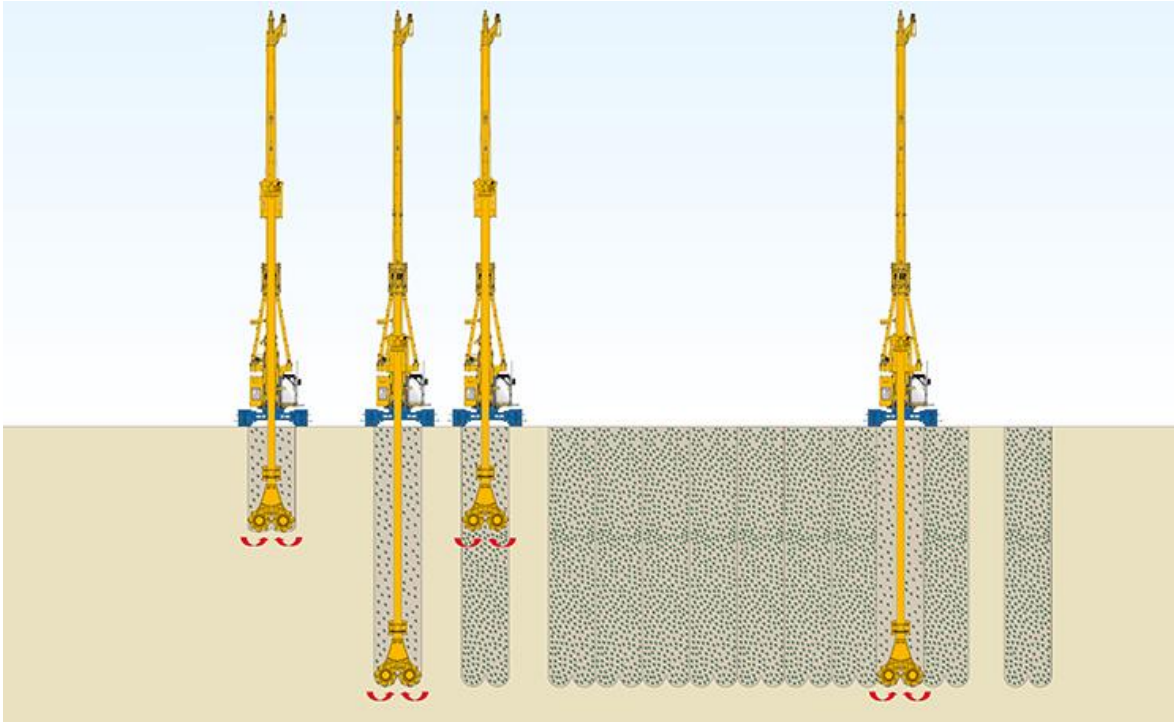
Column-type deep-mixing (Bauer Foundation Corp., 2023)
